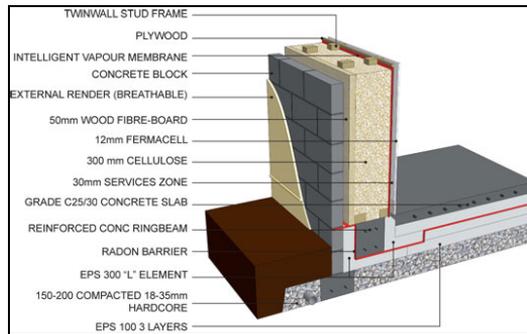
Viking Double L foundation element with a Timber Frame wall and a concrete block external leaf
